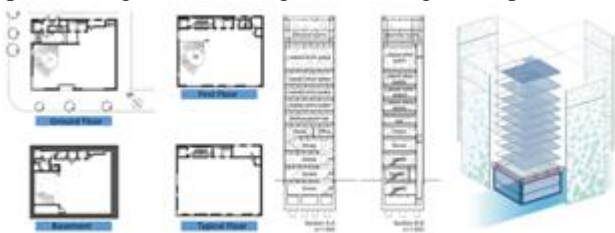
COR Building, the parking level and the elevation view of perforated shell
